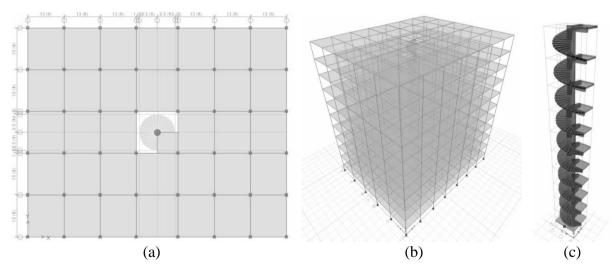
(a) Plan view of 10 story building with spiral stair, (b) Three-dimensional view of 10 story building with spiral stair, (c) Three-dimensional view of 10 story spiral stair
